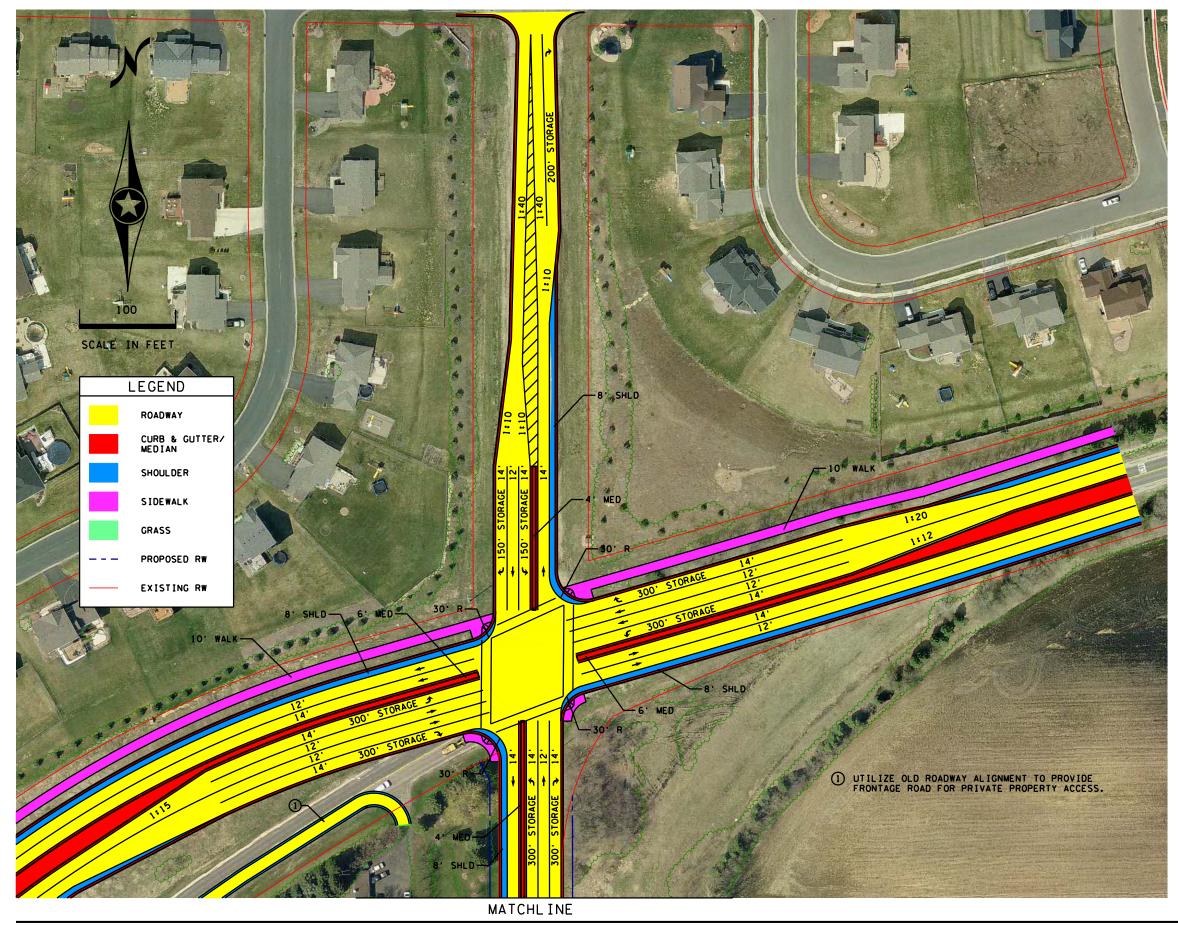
CONCEPT LAYOUT 1a CSAH 9 & HIGHVIEW AVENUE
